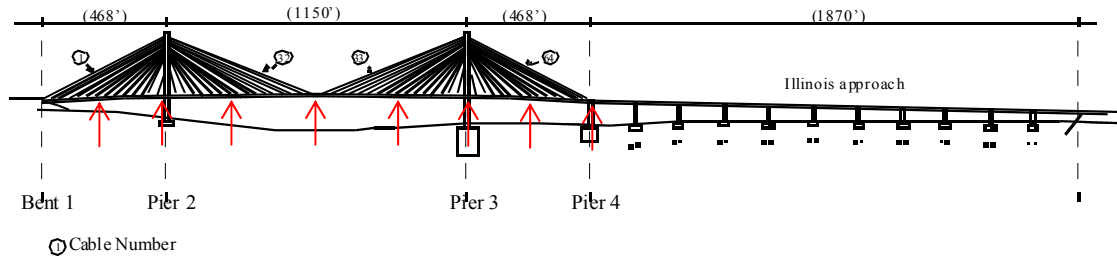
Sensor placement on Emerson Bridge (Arrows denote the sensors)
